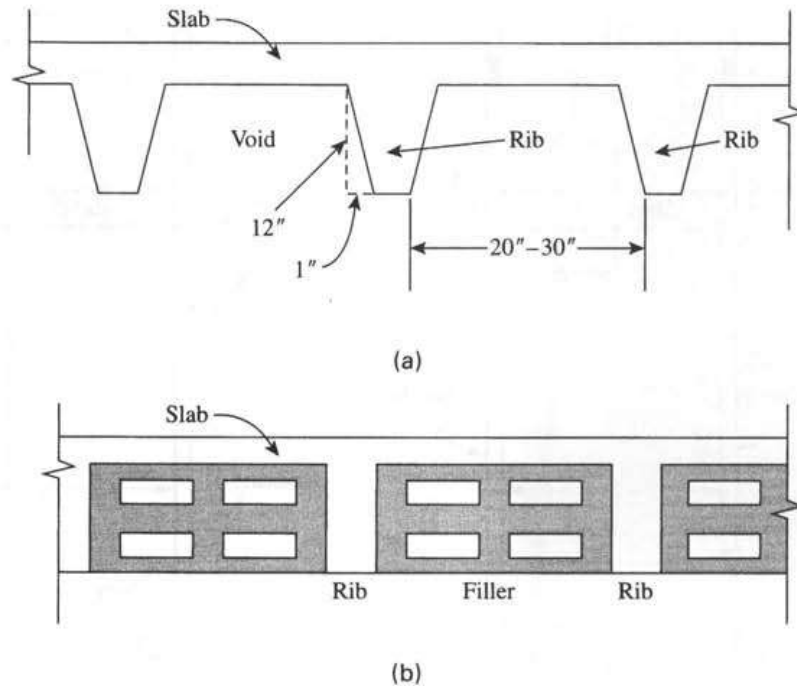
Cross-sections of one-way ribbed slab: (a) without fillers and (b) with fillers.
